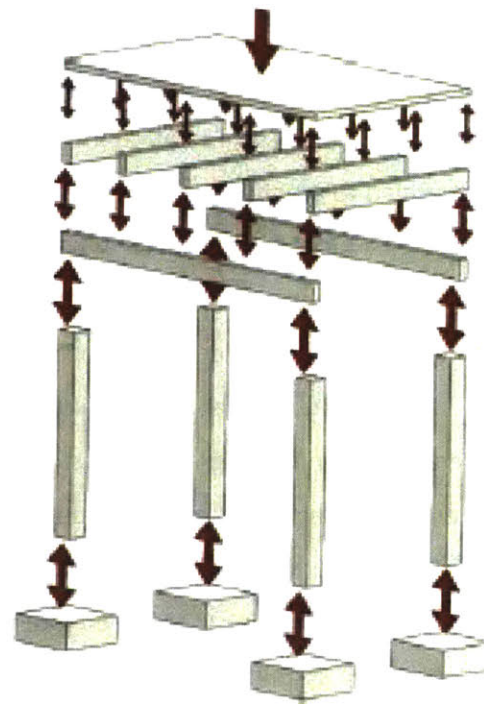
GRAVITY LOAD TRANSFER IN CORNER SUPPORTED MODULAR BUILDING (SHARAFI ET AL., 2017)
